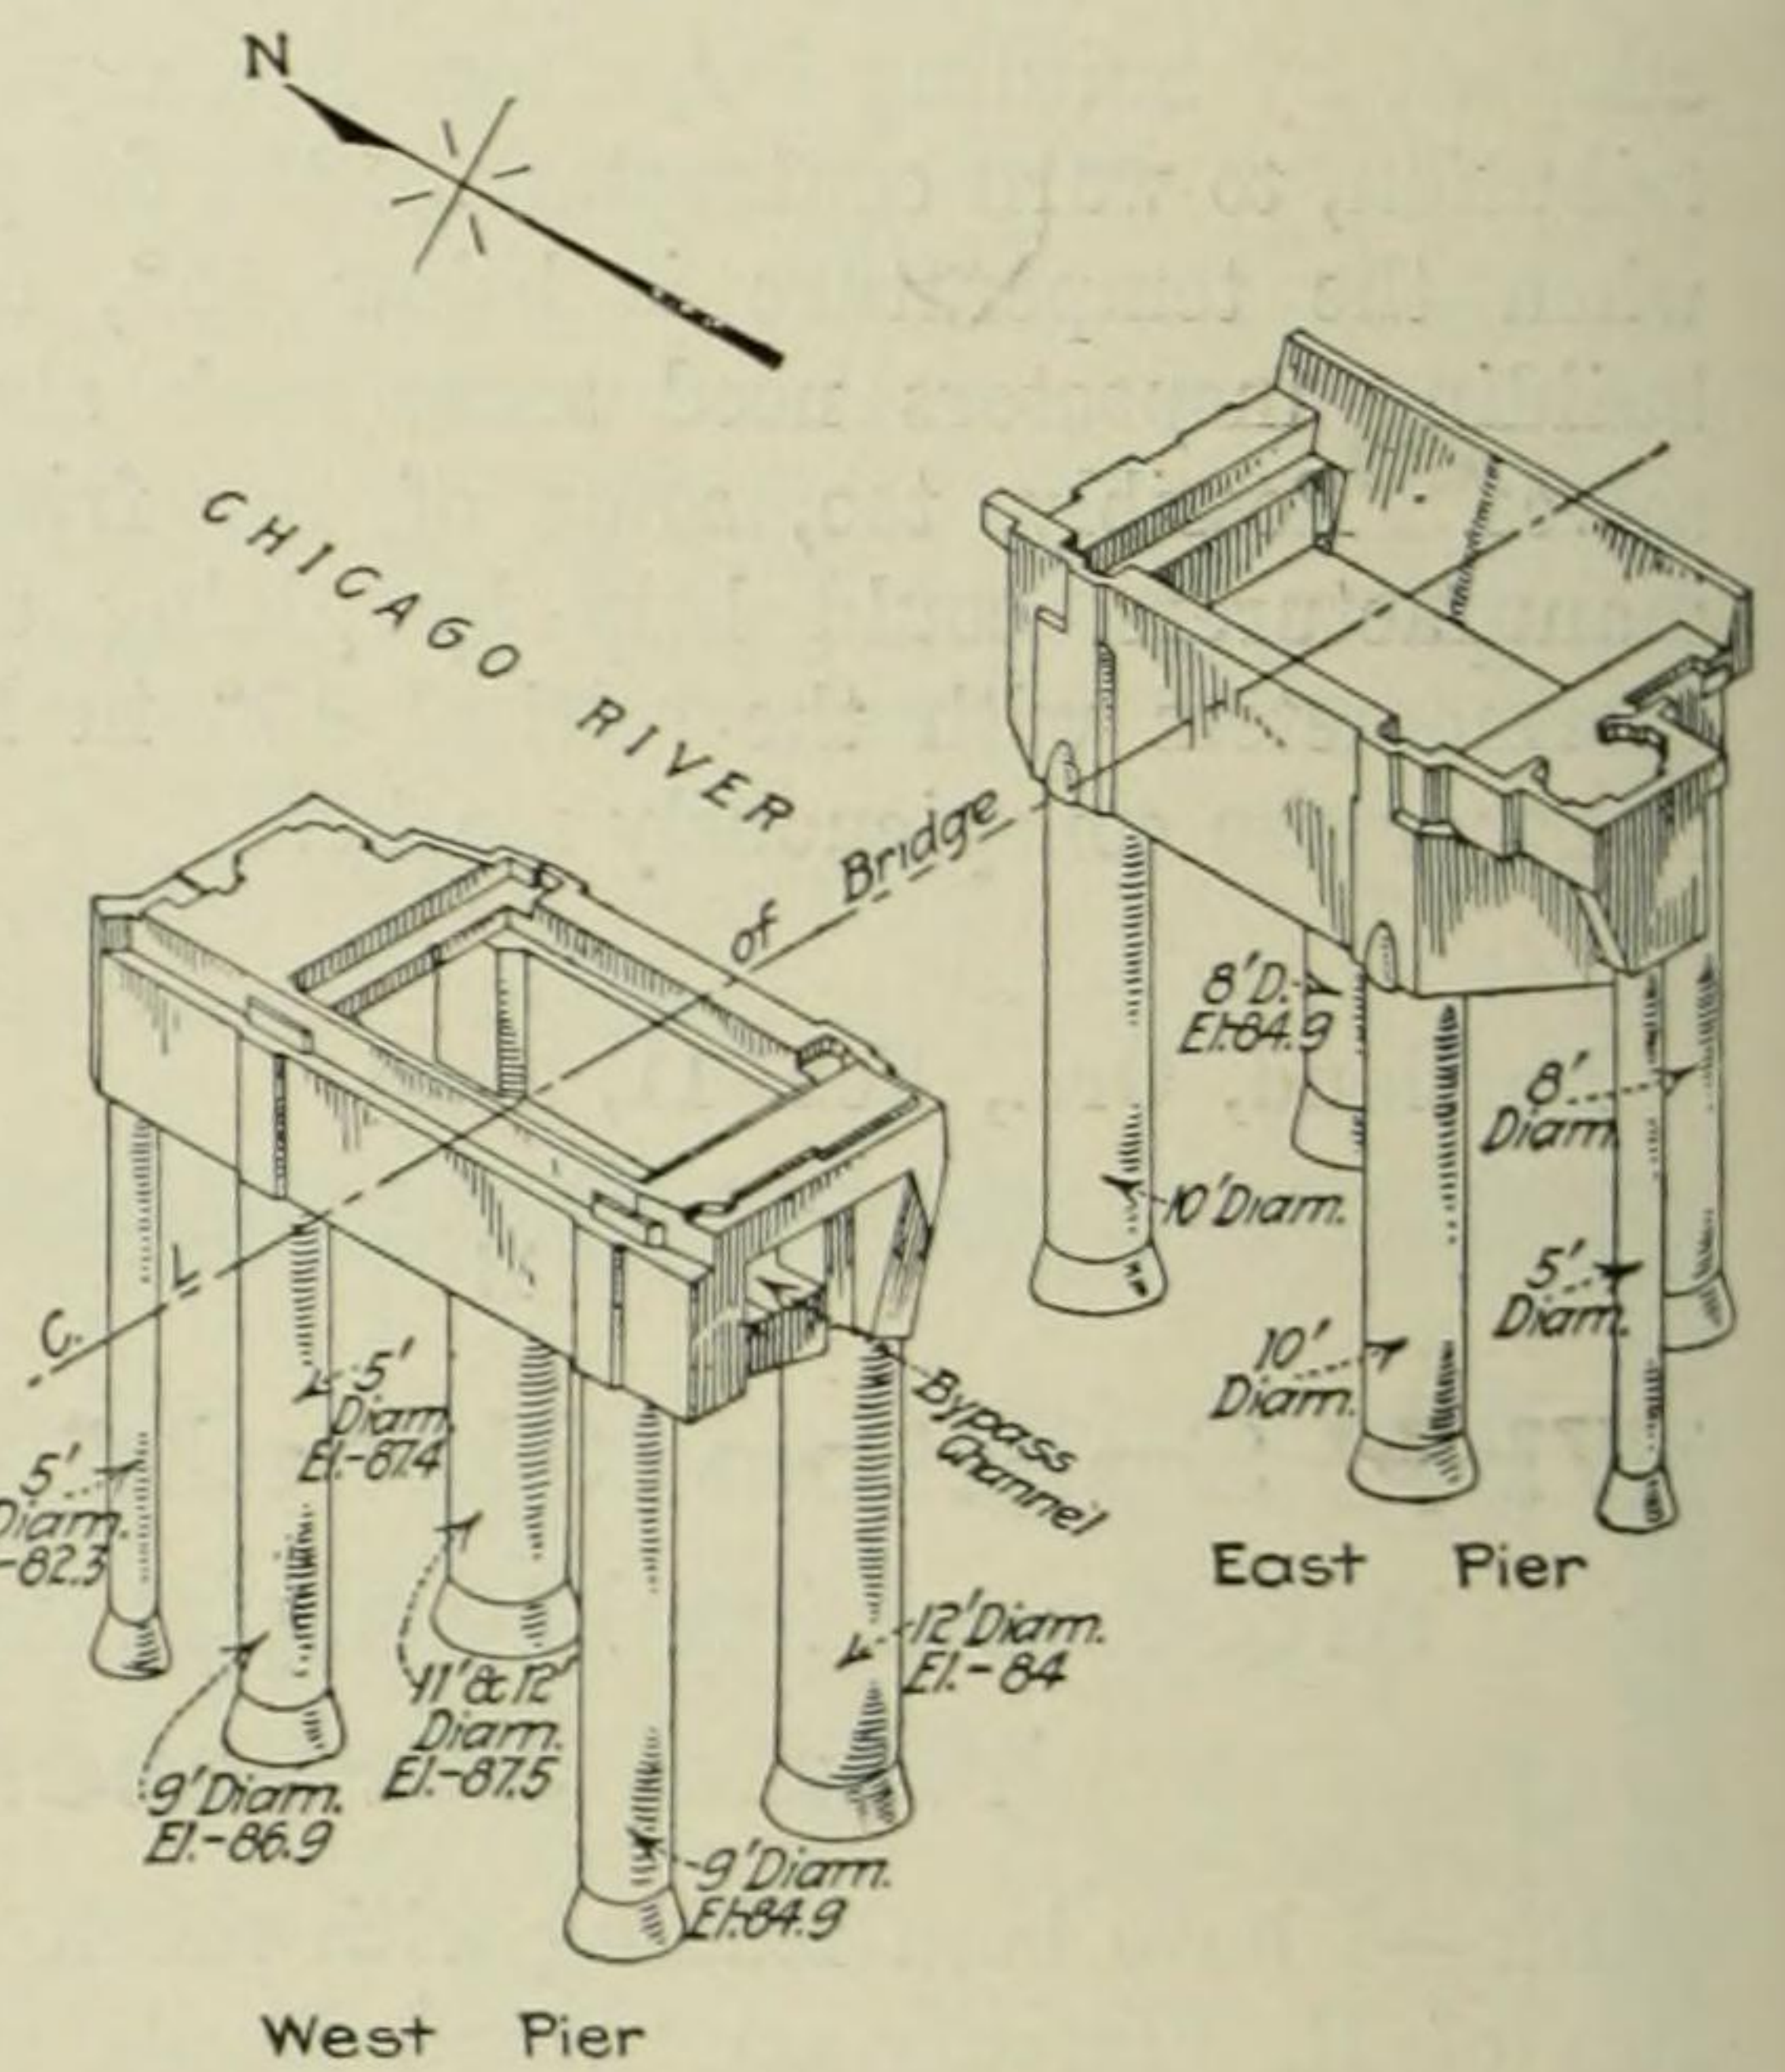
ISOMETRIC ELEVATIONS OF THE PIERS FOR THE NEW BASCULE BRIDGE OVER THE CHICAGO RIVER AT JACKSON ST.
